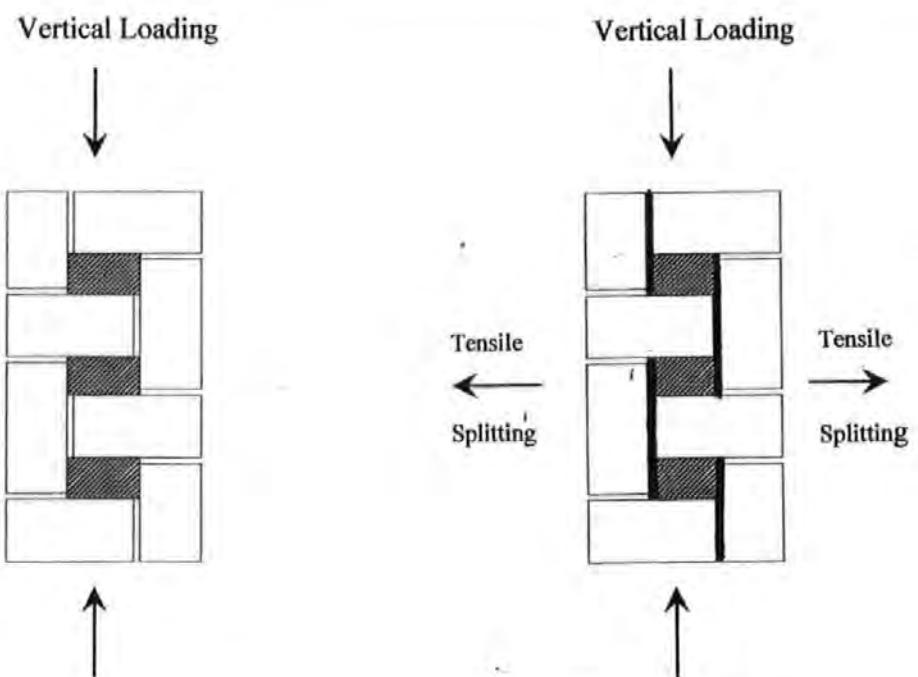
Typical UOP Quetta Style Beam prism Behaviour under load
